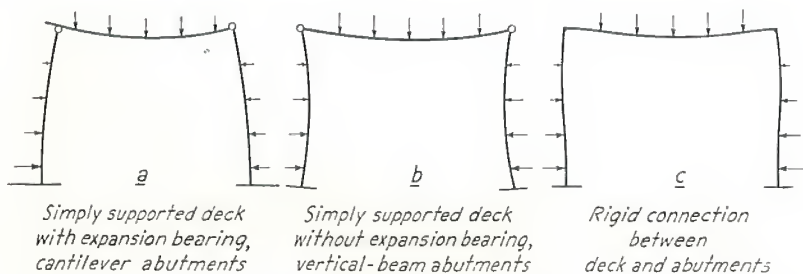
Diagrams illustrating three types of layout applicable to single span bridges.
